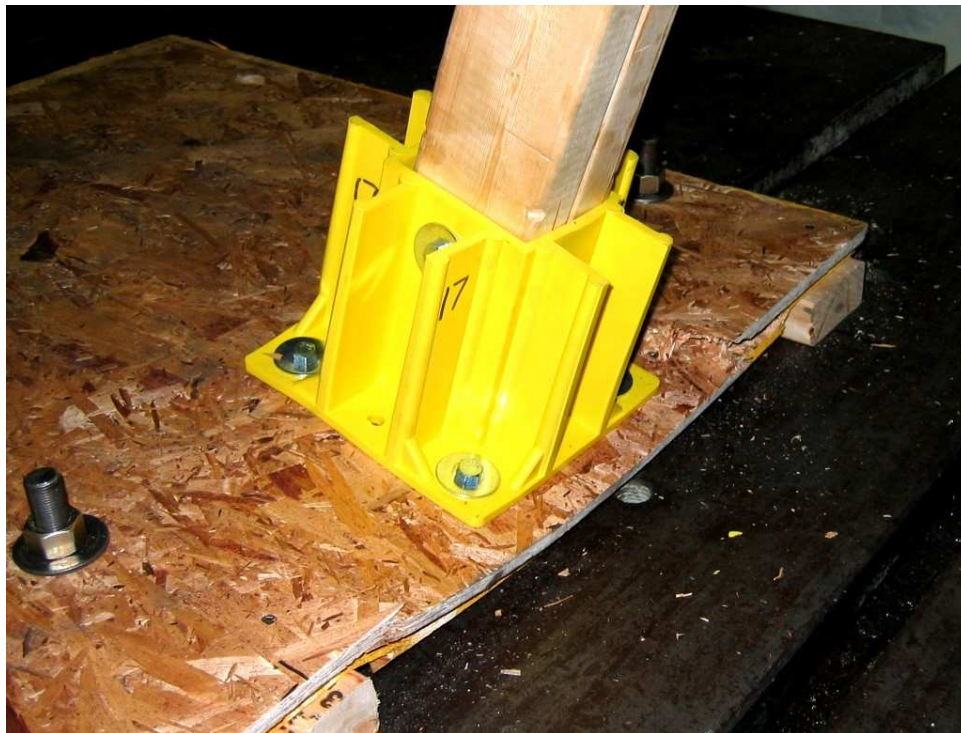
1-1/8 plywood sub-floor fractured in Test #17
